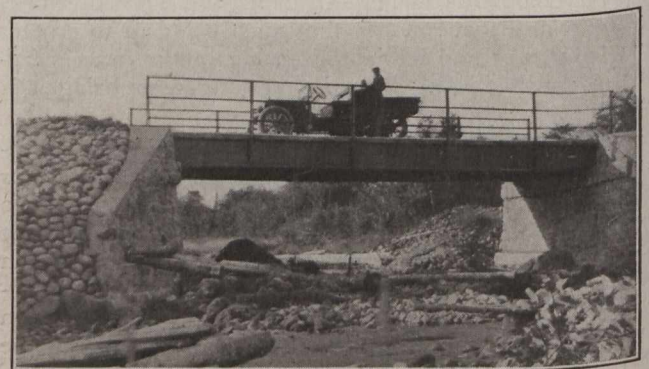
Steel Beam Span on Rubble Stone Abutments Near Sault Ste. Marie.
